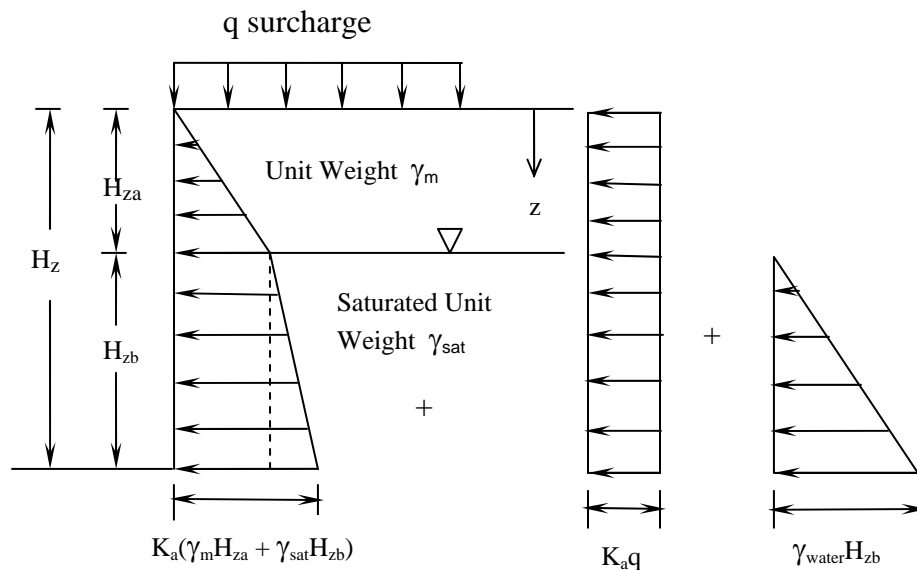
Lateral Earth Pressures on Conventional Rigid or Flexible Walls
